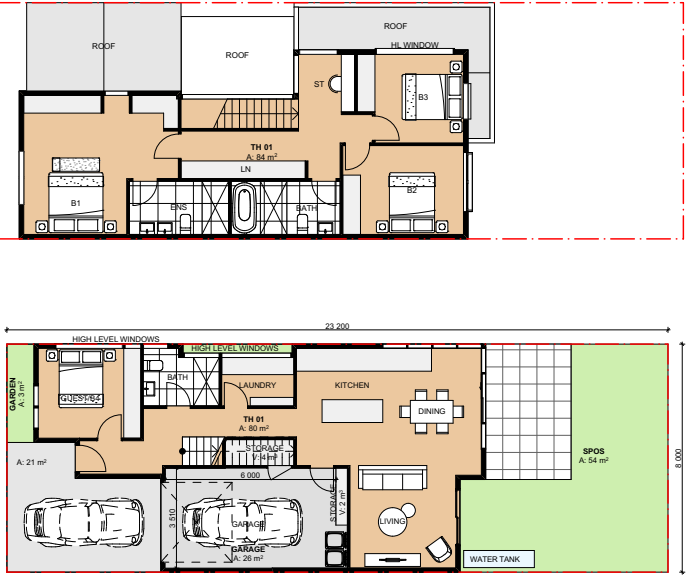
Townhouse Type 01 (Source: Plus Architecture)
